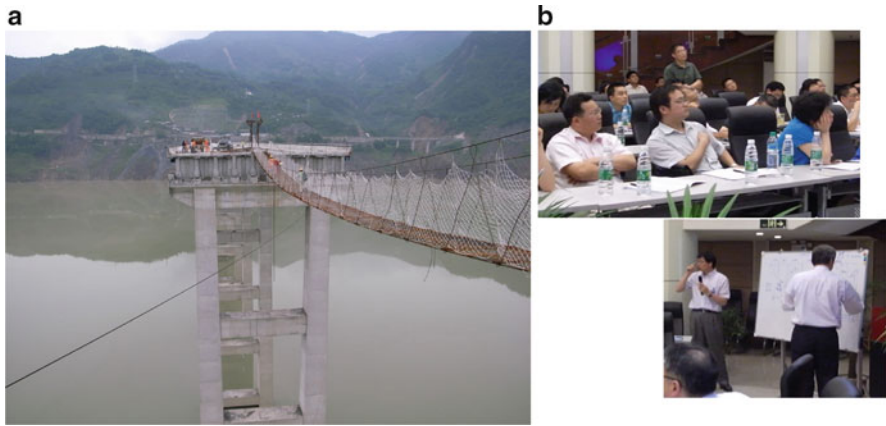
Fall of a expressway bridge girder (2008 Wenchuan earthquake in Shichuan province, China). (a) Fallen span and scaffold work. (b) Conference for restoration of the damaged bridge
